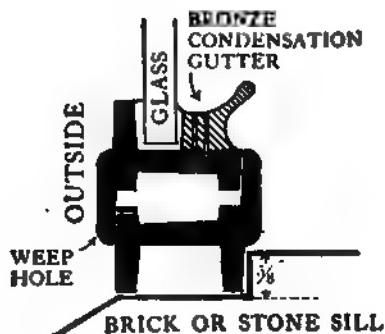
Lower Rail of Metal Casement-Window in Masonry Wall.
